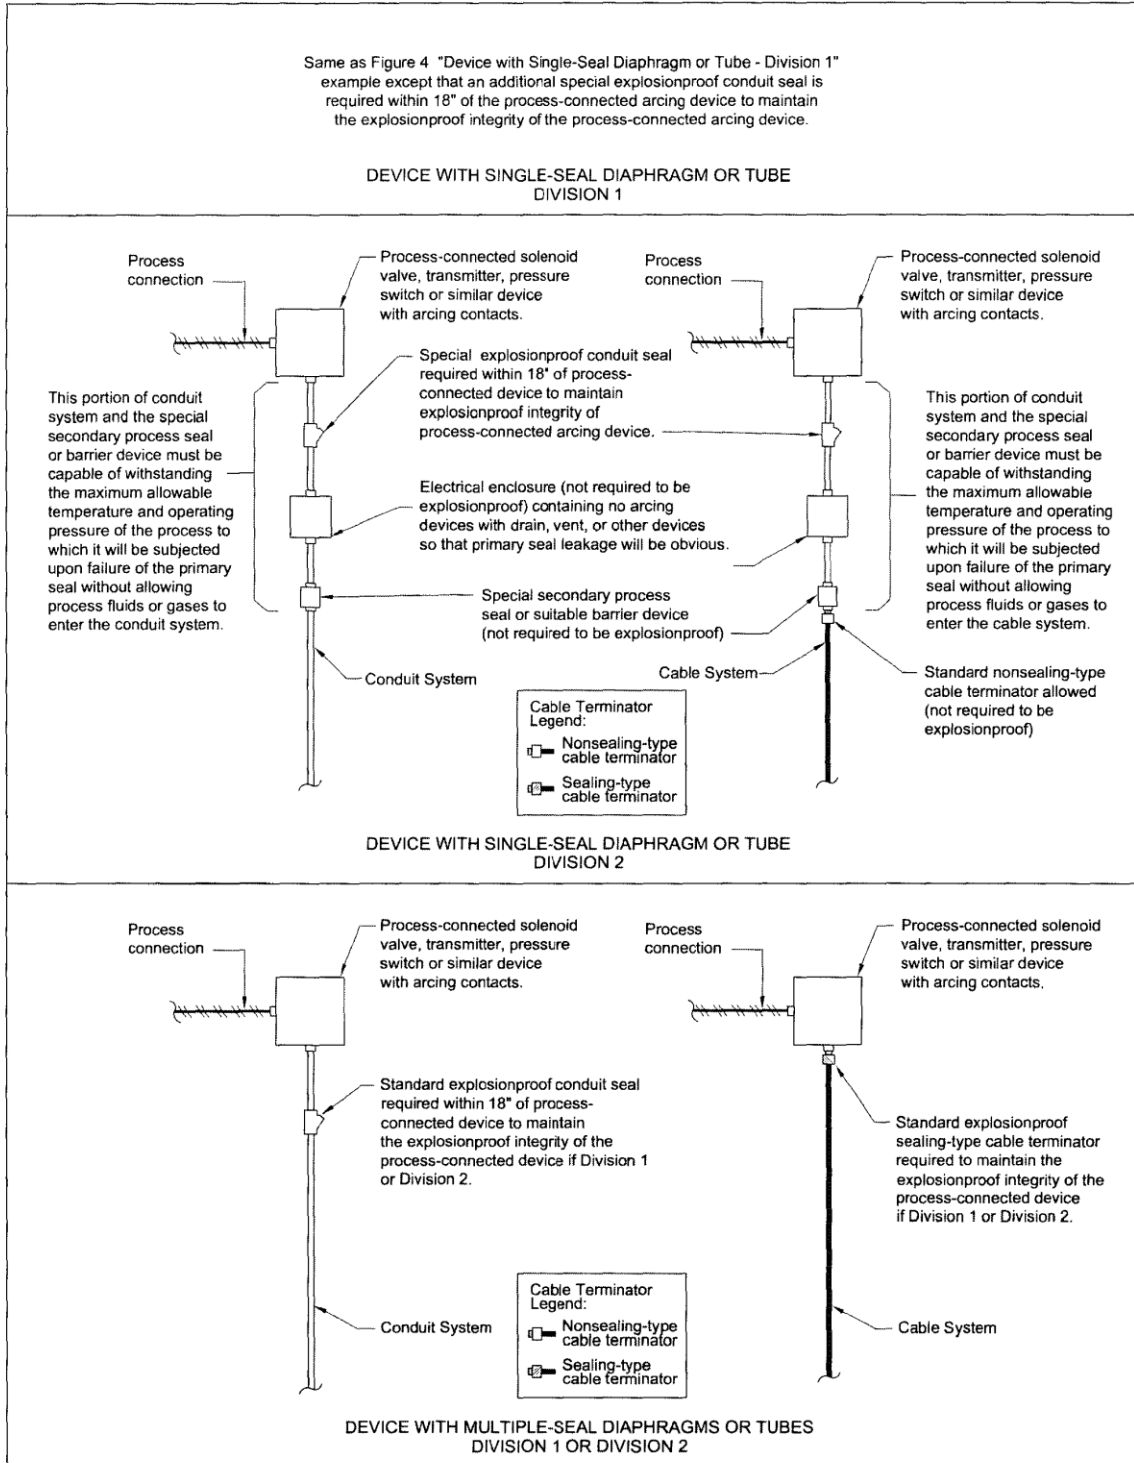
Typical Class 1, Division 1 or Division 2 Electrical Installation Conduit or Cable Connections to Process-connected Arcing Devices
